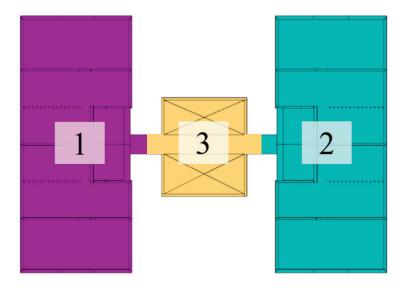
Each tower block can be considered as three separate buildings; the two residential blocks and the lift/stair core.
